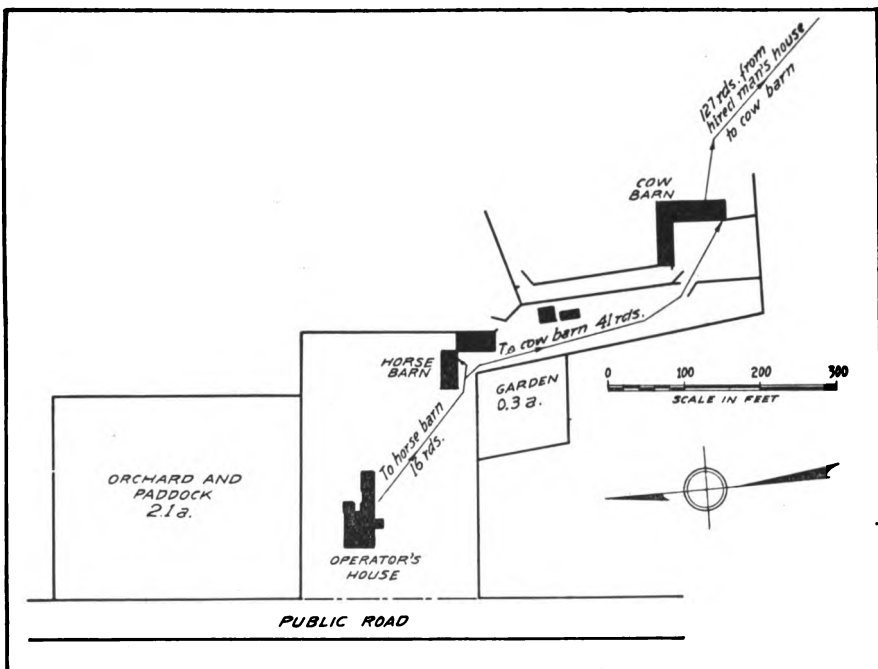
AN ARRANGEMENT REQUIRING MUCH UNNECESSARY TRAVEL
